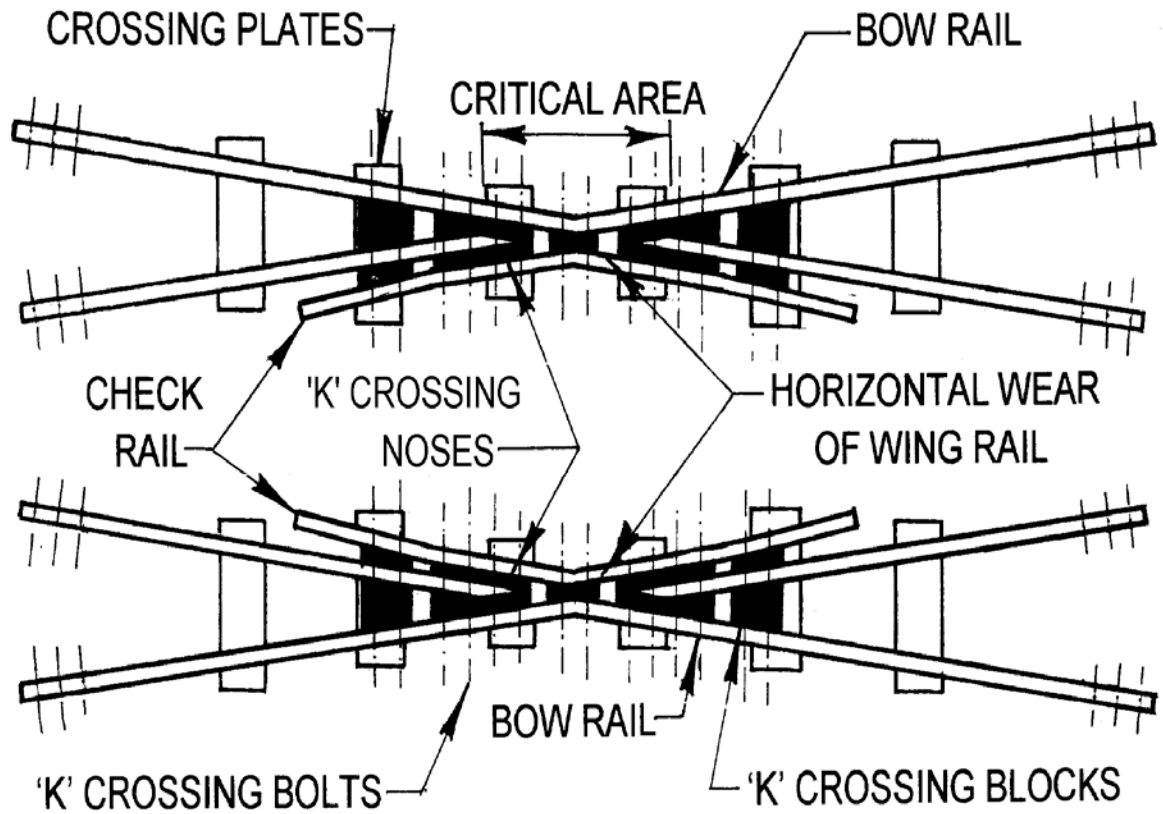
Typical 'K' crossing assembly (shown for fabricated type)
